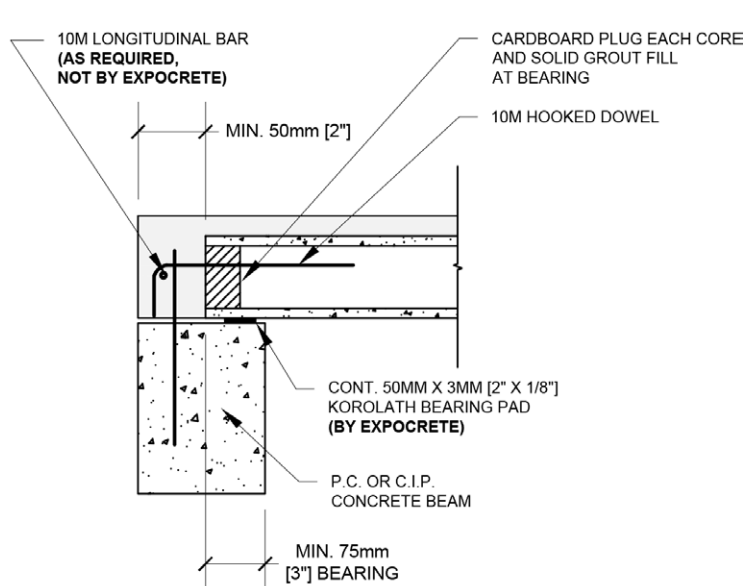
End Bearing On P.C. OR C.I.P. Concrete Beam (Scale - N.T.S.)
